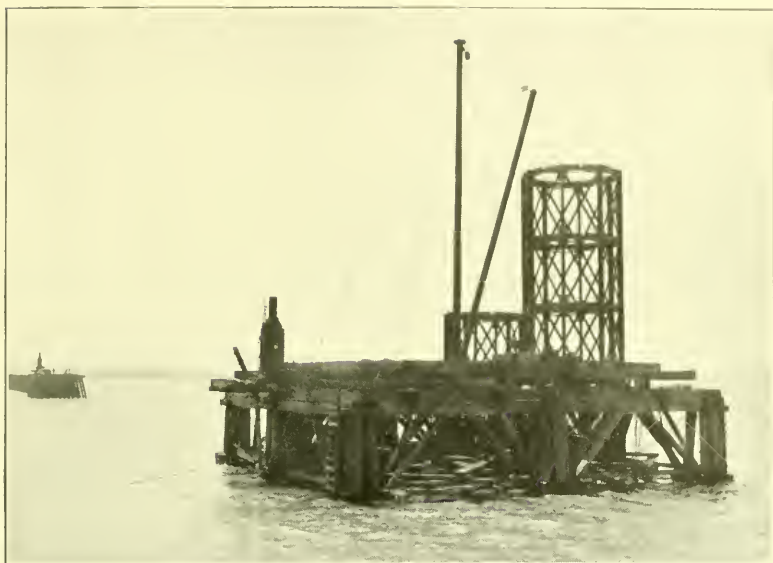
ERECTION OF GUIDE-FRAMES, WEST ABUTMENT PIER,
